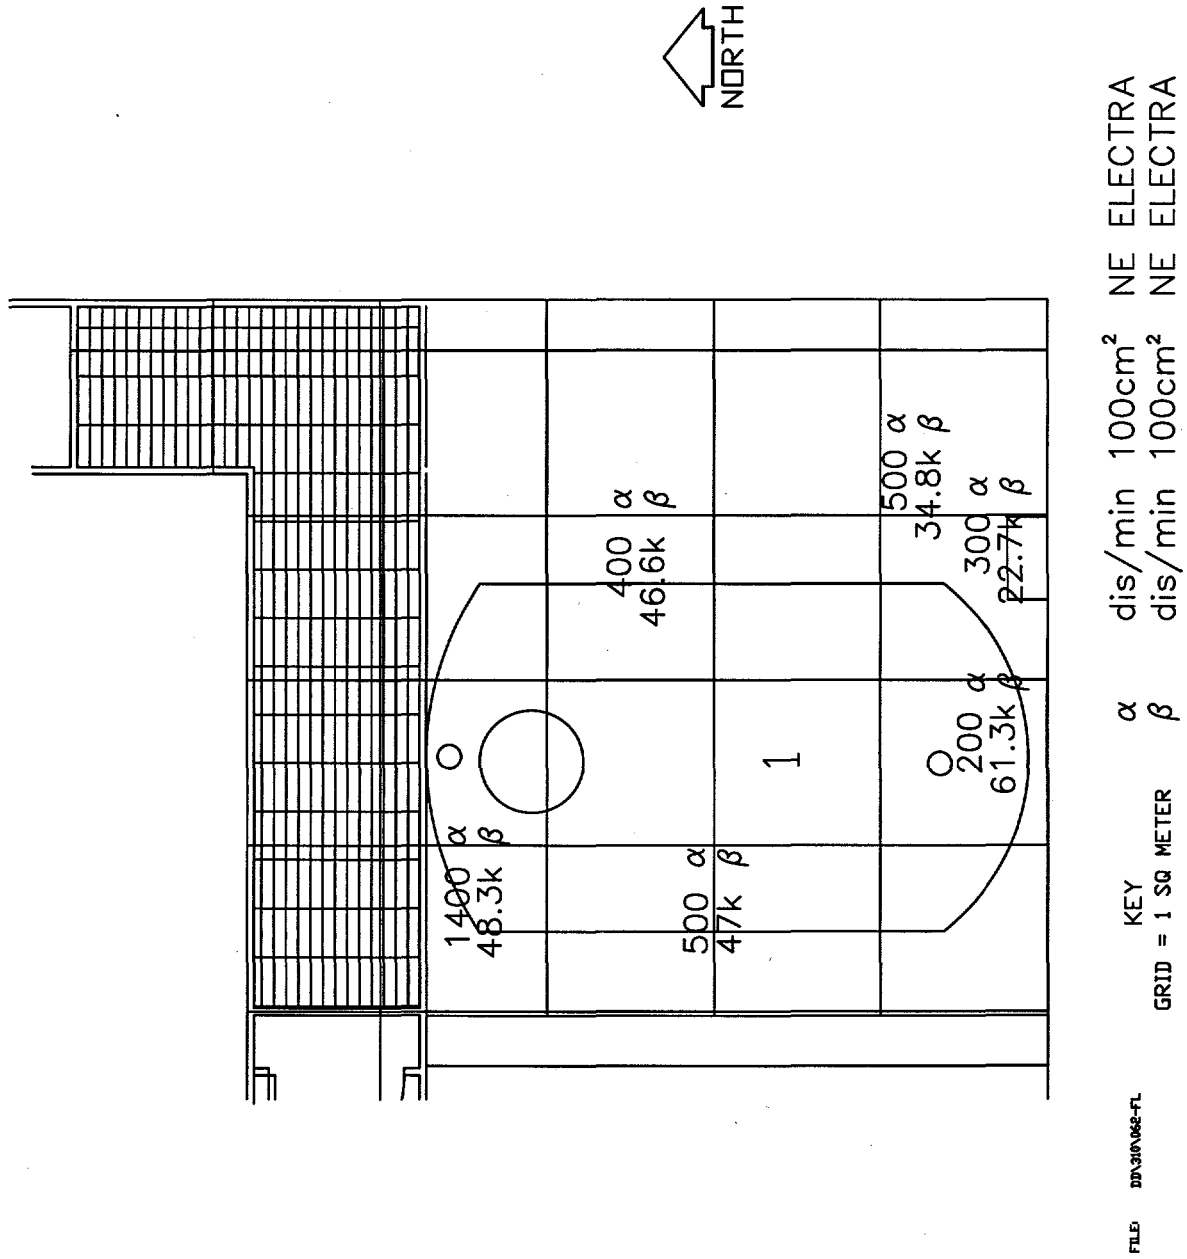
Building 310 Retention Tanks; Room 062 Floor
